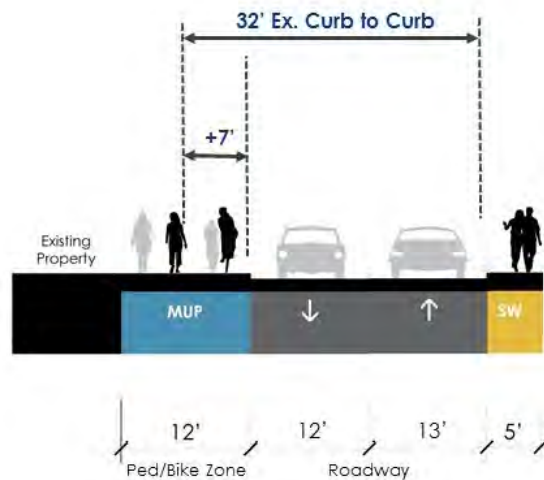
Typical Section 16th St. NE (Main Street to Centennial Trail)
